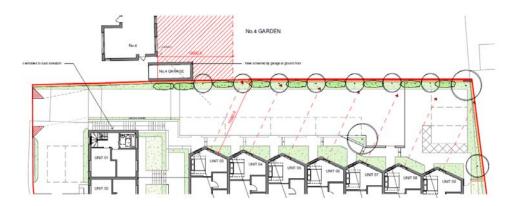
Plan showing protected area of neighbours garden (red hatching) and angled windows in proposal
